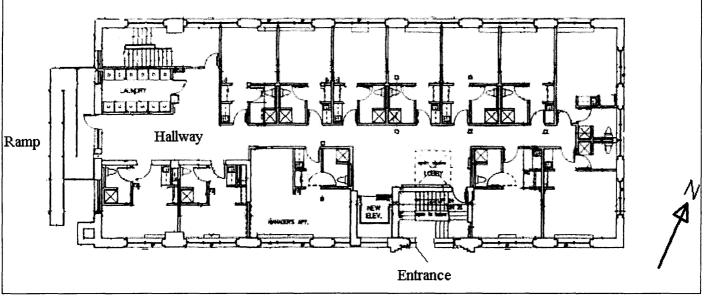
Current first floor plan (Ben E. Allers, P.C. Architect, September 1994)
